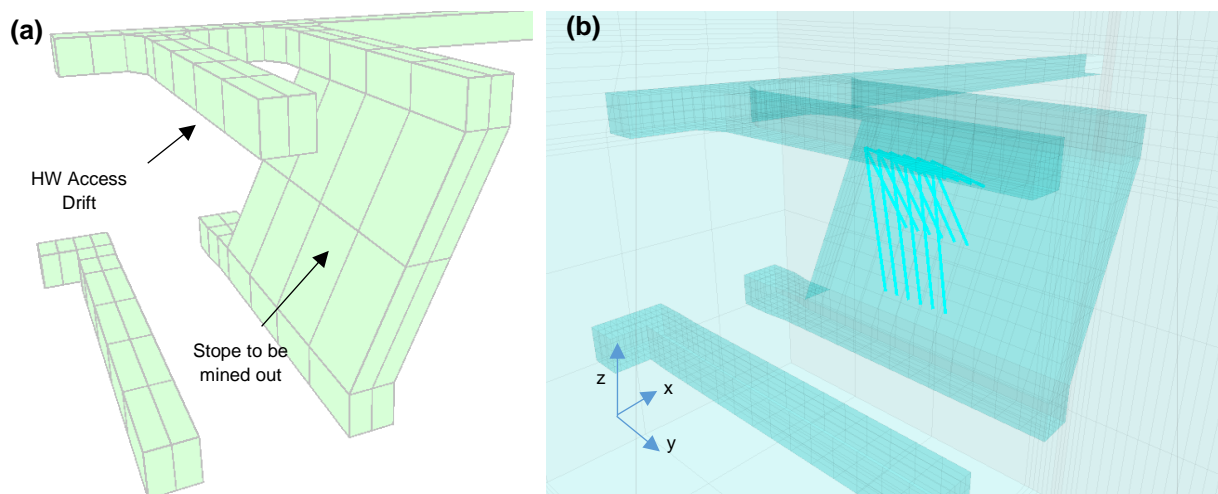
(a) Isometric view showing the geometry of the mining area consisting of top and bottom drifts and a shallow dipping stope to be mined-out. (b) Addition of structural elements to the model representing cable bolts
